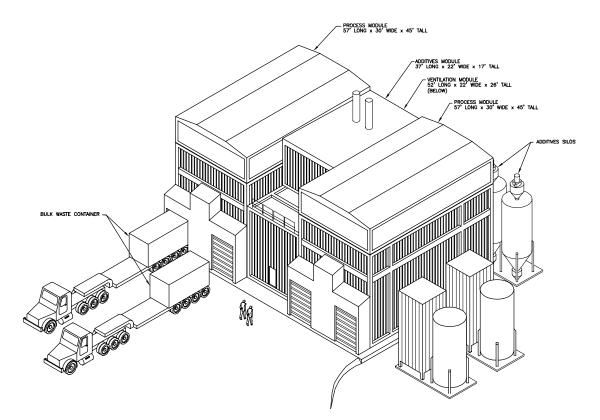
THOR-272 MODULAR SYSTEM ASSEMBLY
